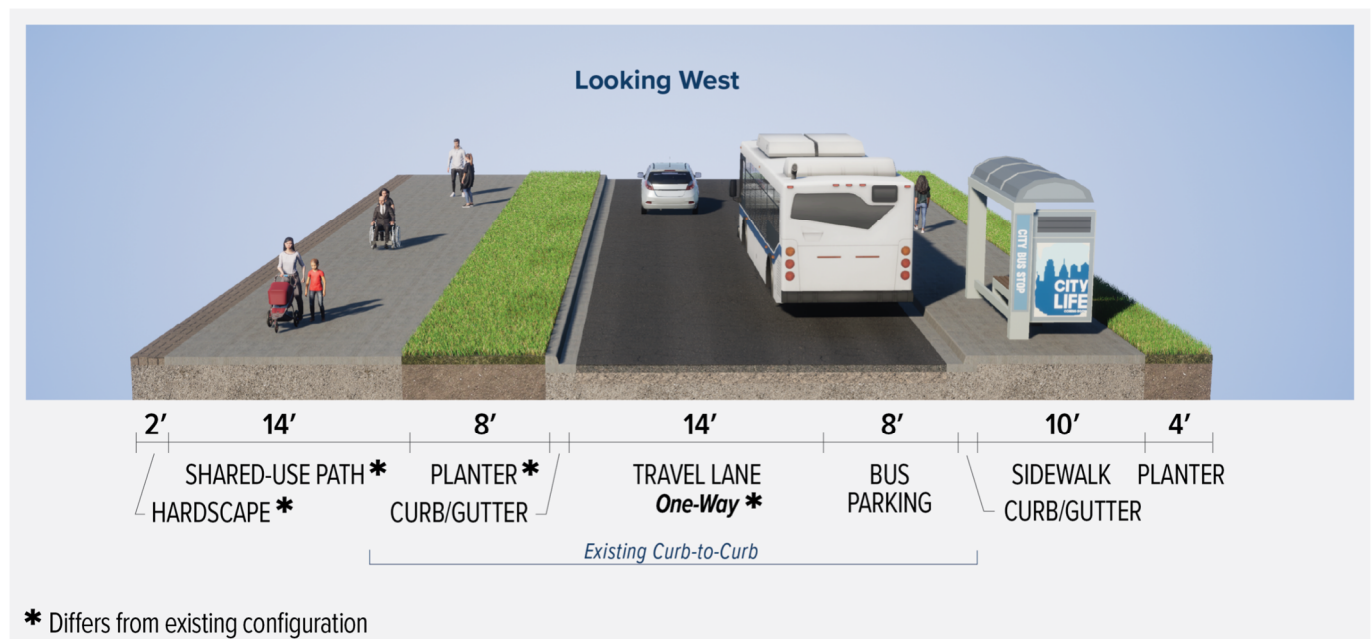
SHARED-USE PATH BETWEEN 3RD STREET AND 4TH STREET
